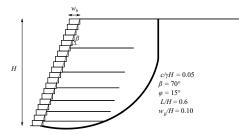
Case of unstable reinforced soil structure: predefined reinforcement length too short (D = H/3, modified force direction, LID distribution).
